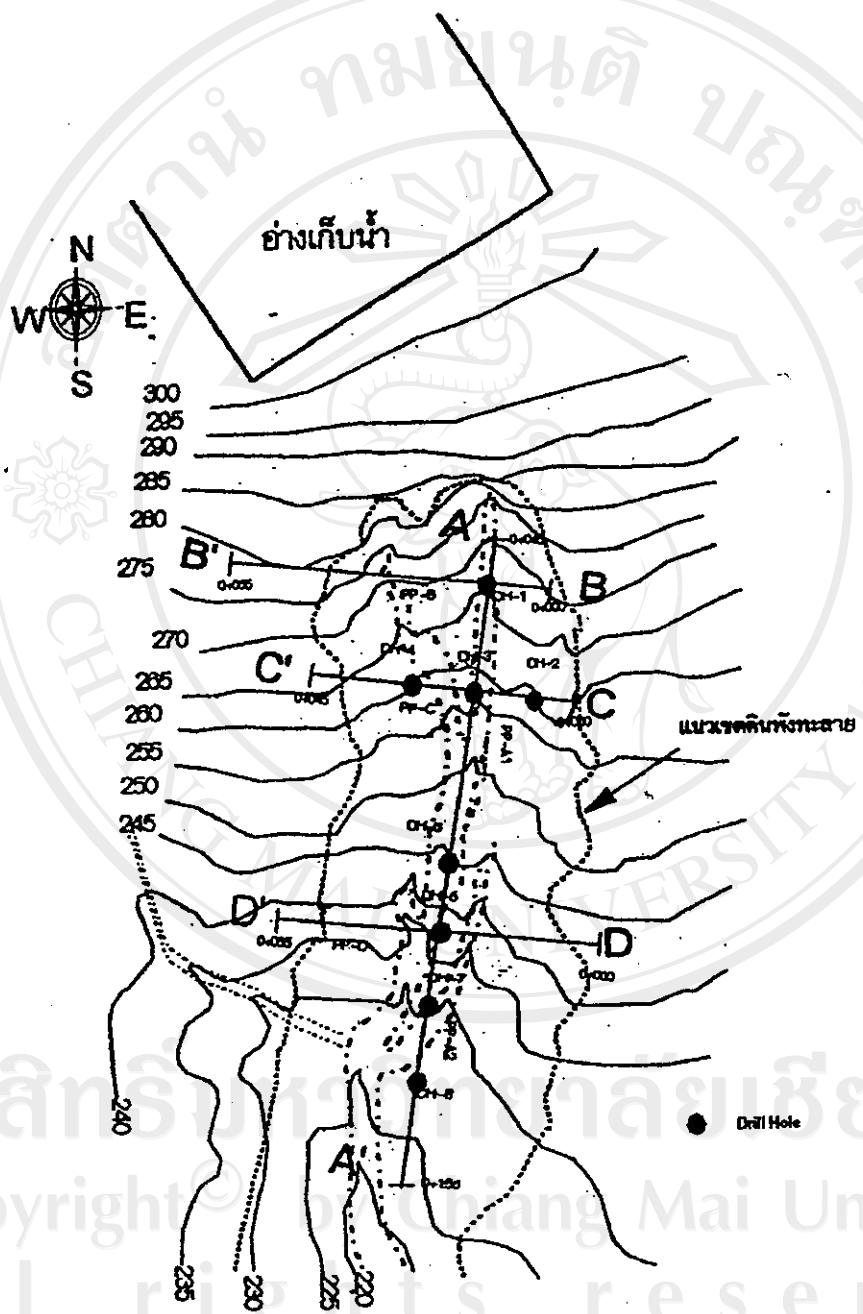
Profile plan of the mountain slope in Bhuping Palace, Chiang Mai
